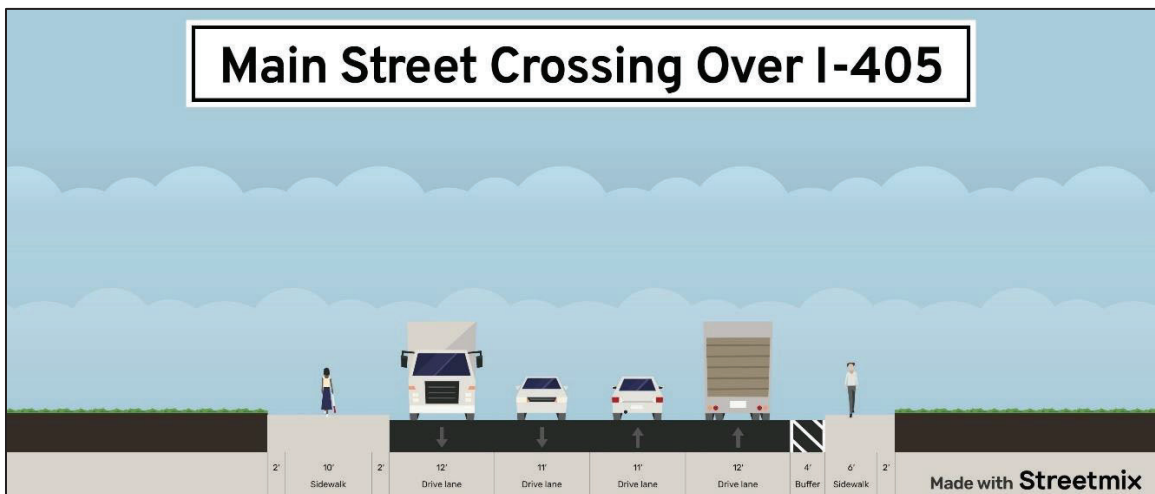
Existing Main Street Cross-Section for the Crossing Over I-405 (facing west)
